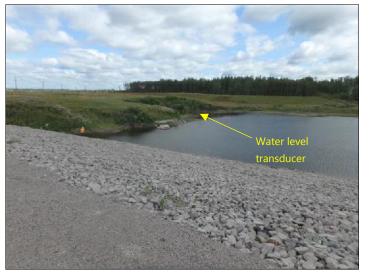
Stockpile Diversion Channel Stability of Structures Photo Station P13
